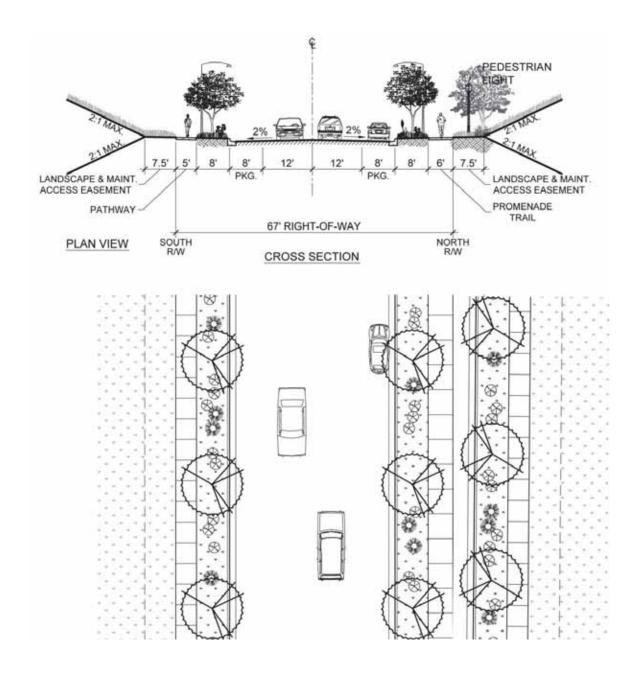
Residential Promenade Street (Modified) Santa Tipu (Street "B")
